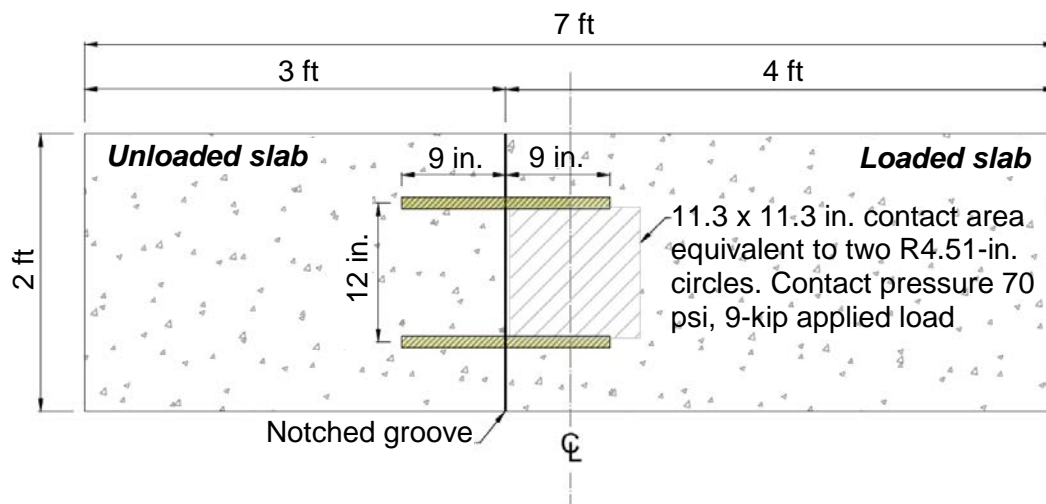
Test configuration of slab, dowels, and loading plate geometry (plan view).
